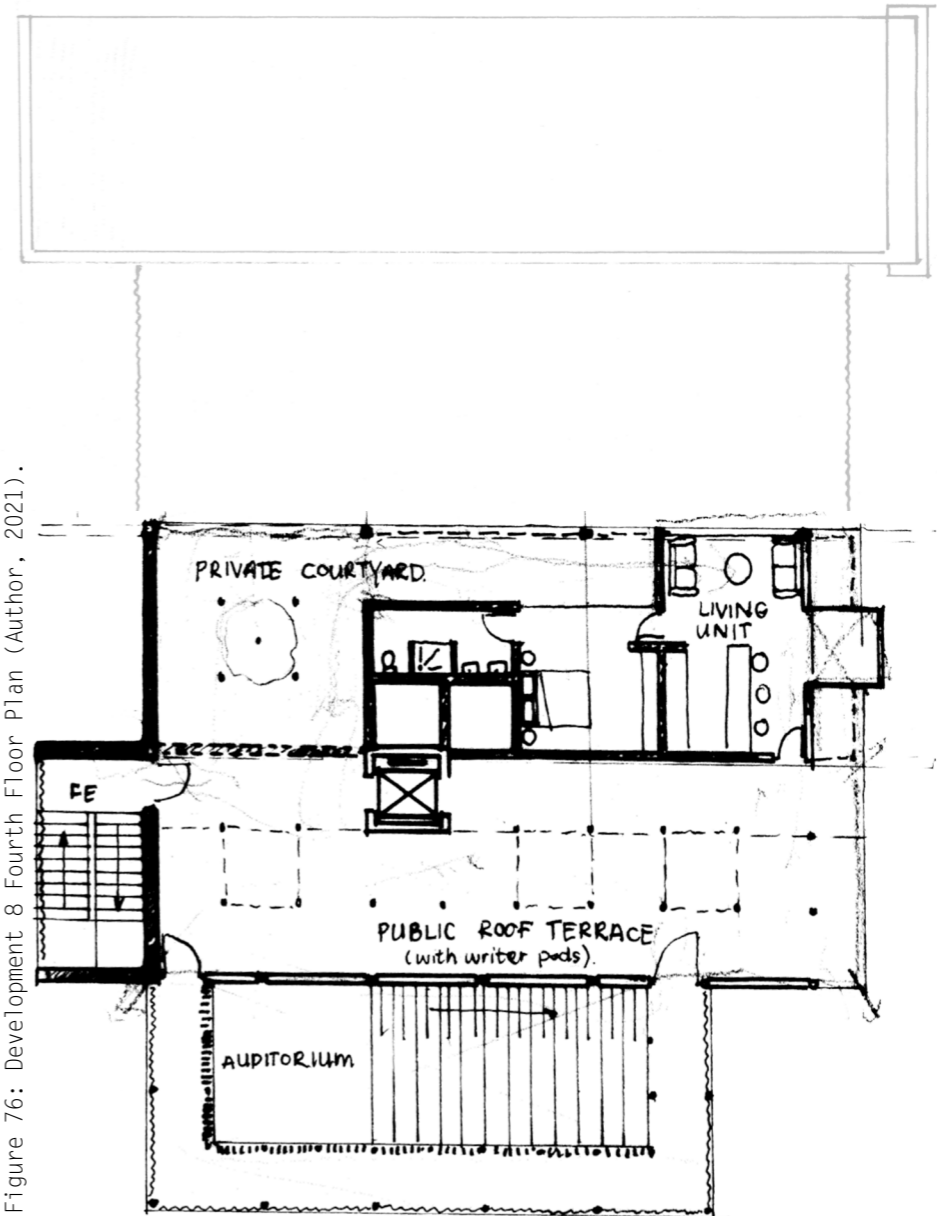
Development 8 Fourth Floor Plan (Author, 2021).
